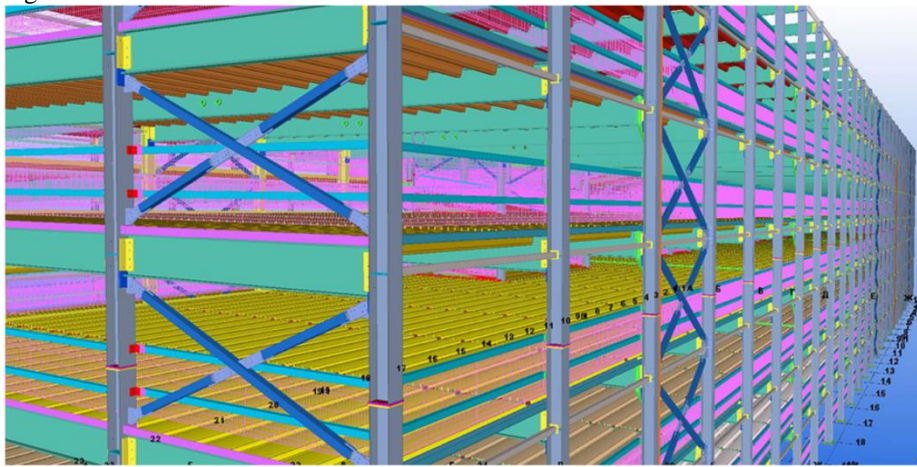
Steel frame constructions view of the parking in 22, Mitiska str., Moscow
